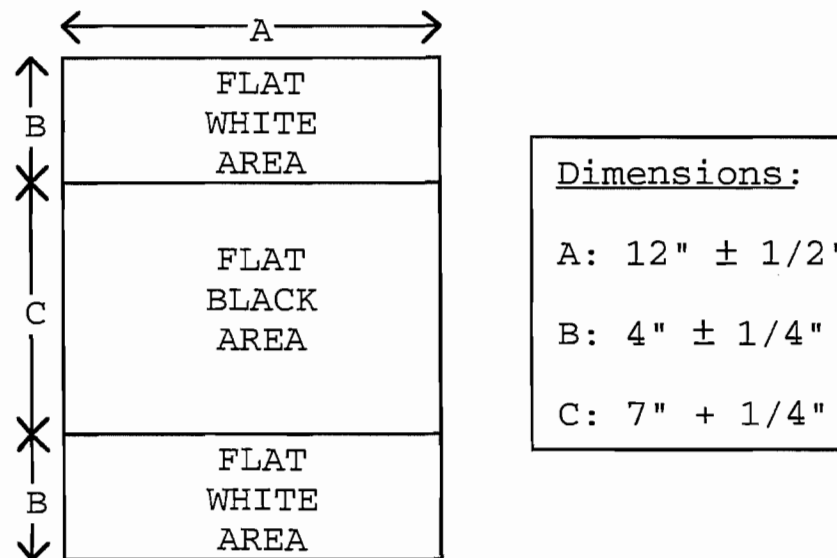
Detail Drawing of Abbreviated Premark
